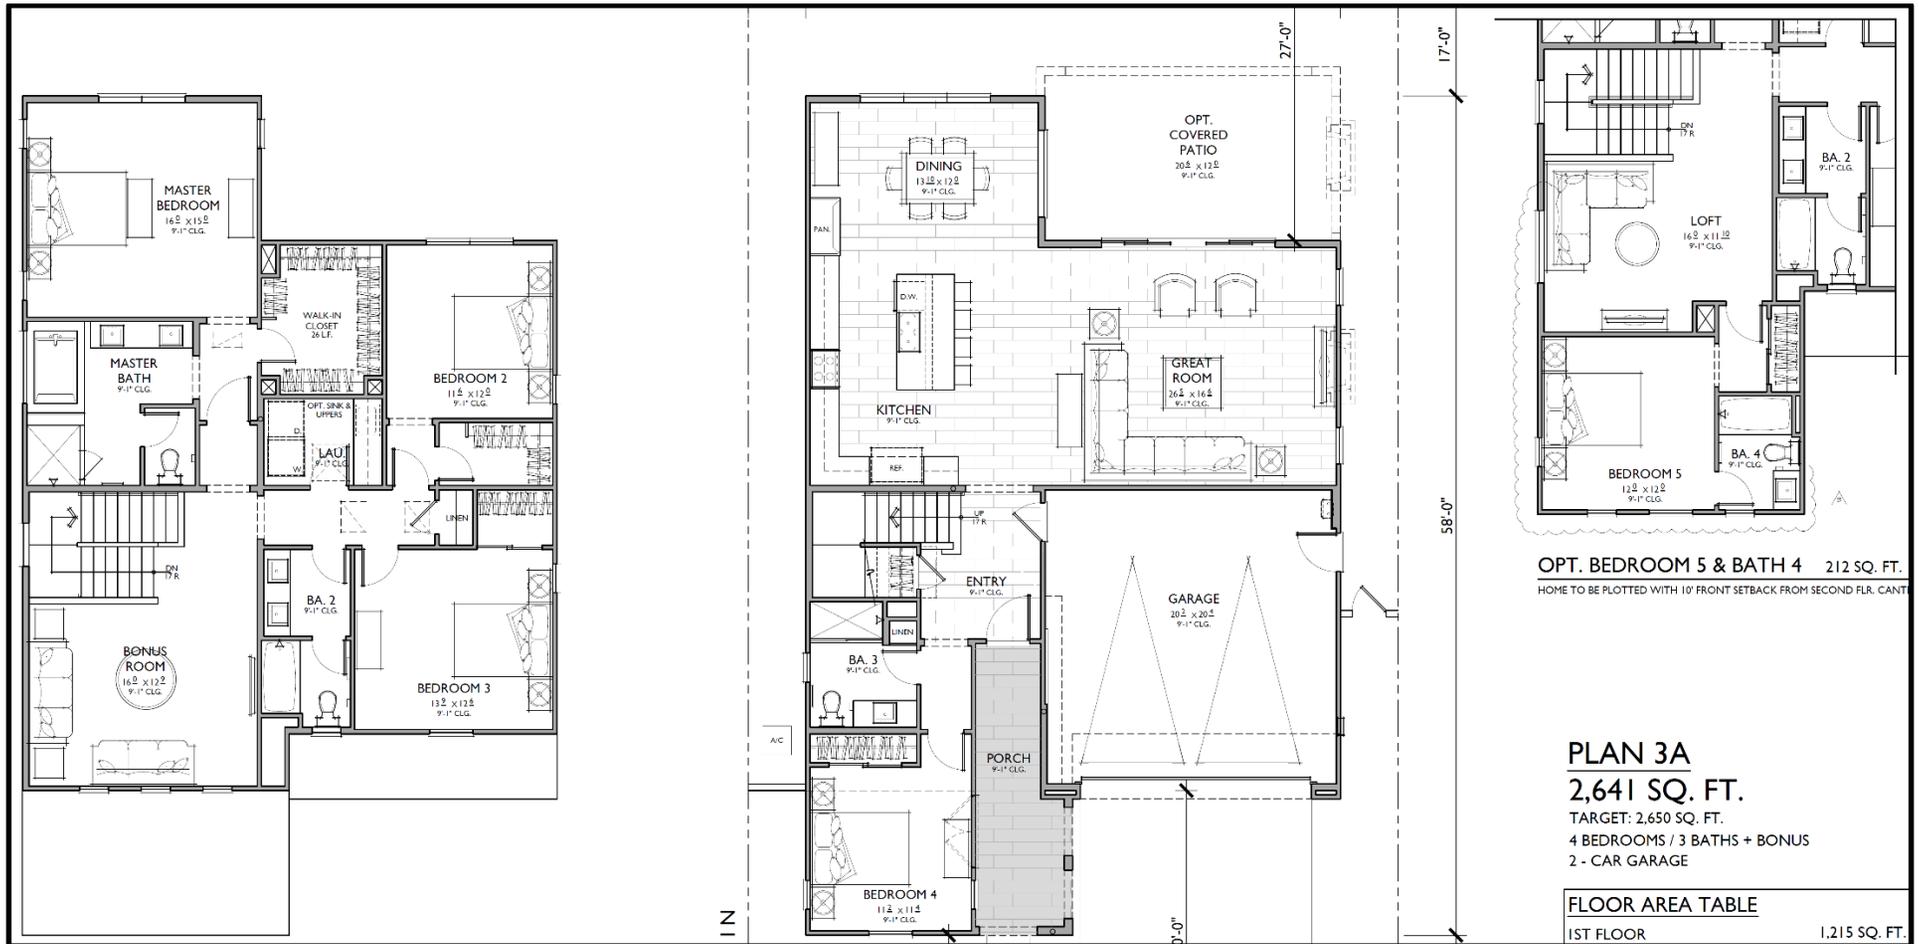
Exhibit B — FLOOR PLAN AND EXTERIOR ELEVATIONS — PLAN 3
